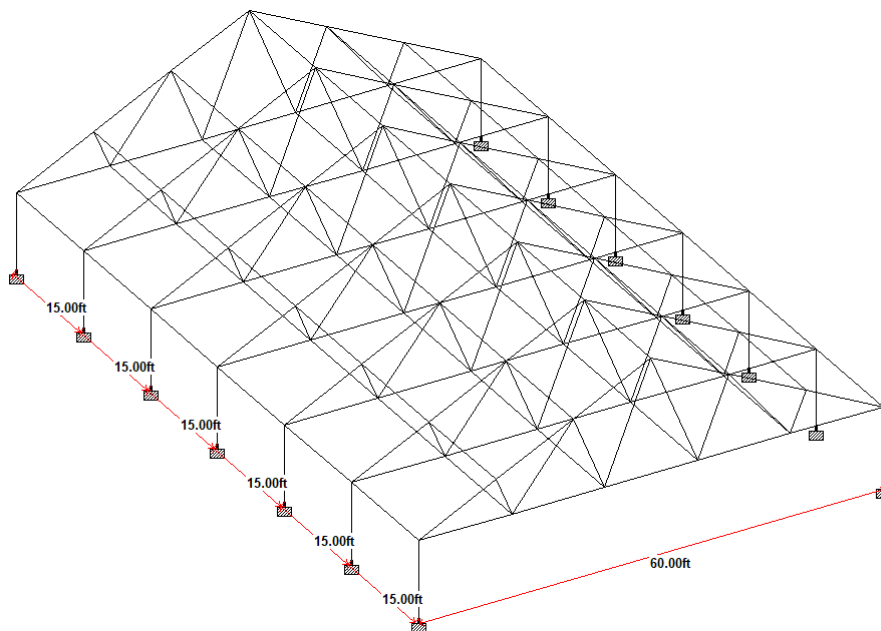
Three Dimensional View of the Roof Truss (Fink Type)
